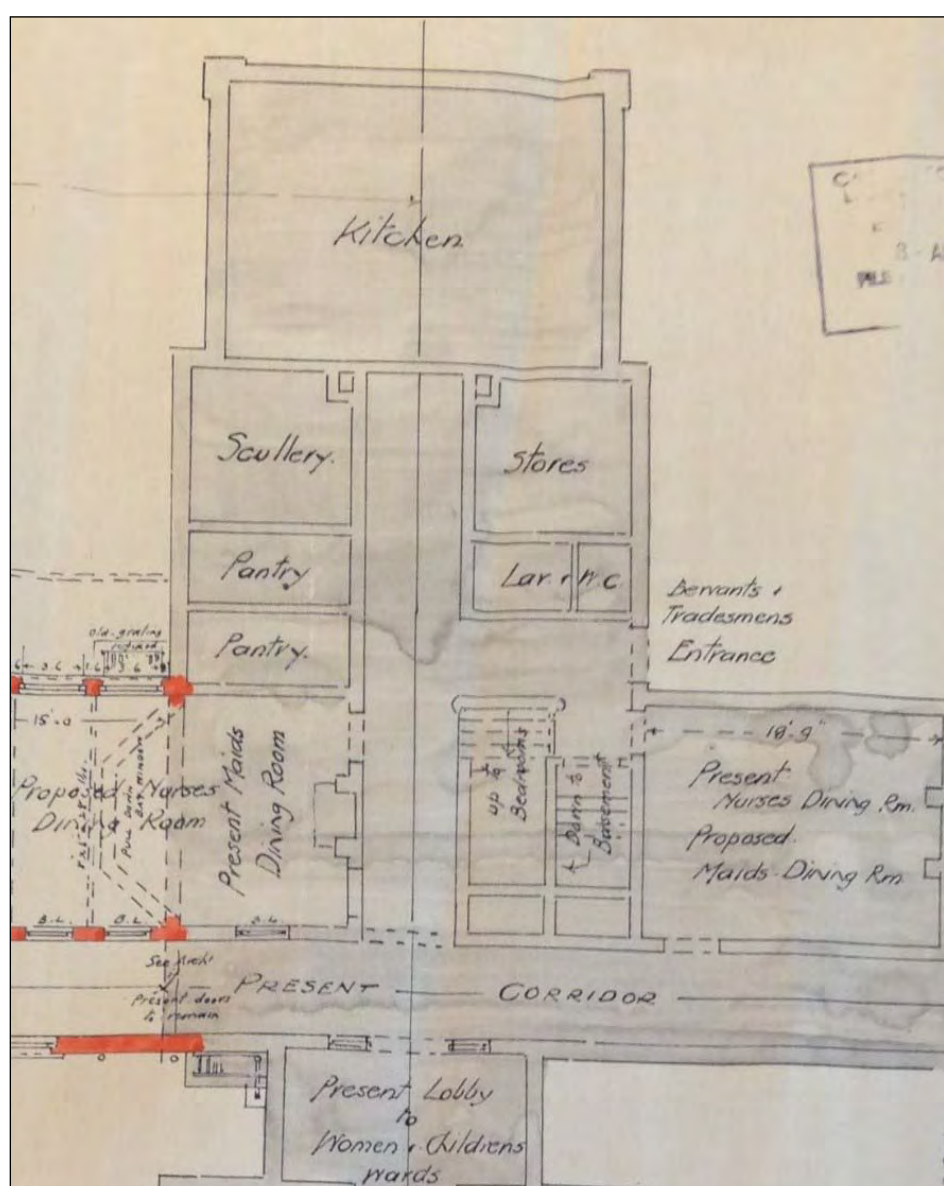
West wing of original building at ground-floor level (WYAS: Wakefield WMT/CA/4171, plan 1).
